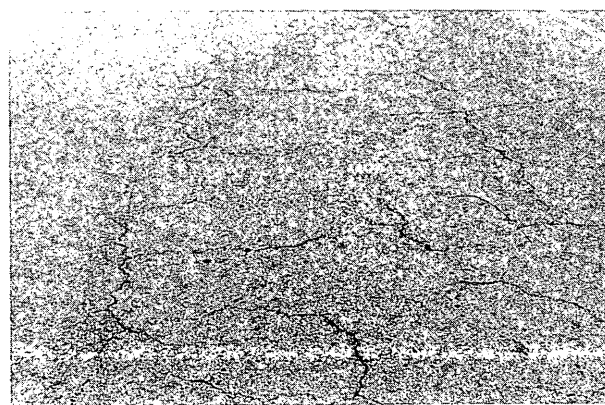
Typical block cracking in SEA section of Test Road 3 (KFUPM).
